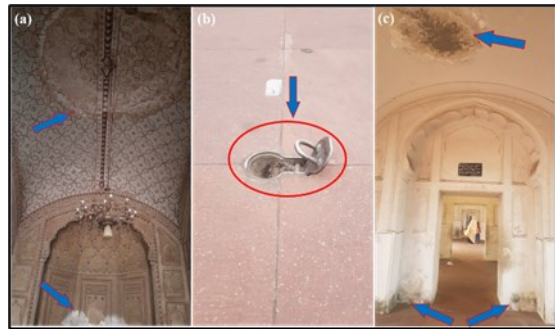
(a) Distortion of Roof seepage and on the wall below at Mihrab level, (b) Rain water drain hole at Lawn full with mud, (c) Accumulation of dust on inside walls. Source: captured by the author.
